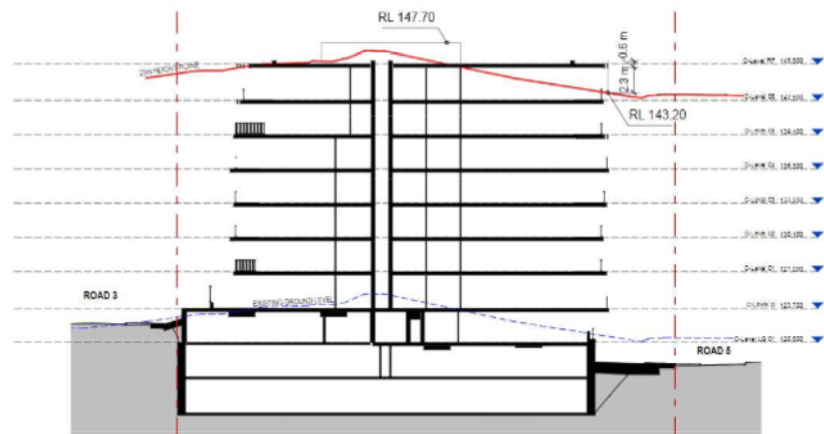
South Section of Building C showing the extent of height contravention (2.9m) (Source: Mirvac Design)
